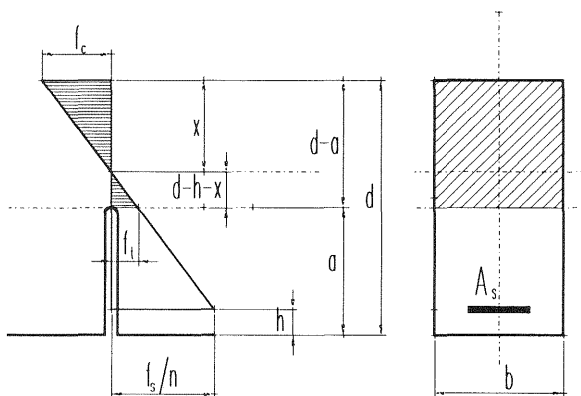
Stress diagram on a cracked cross section of a reinforced concrete beam
